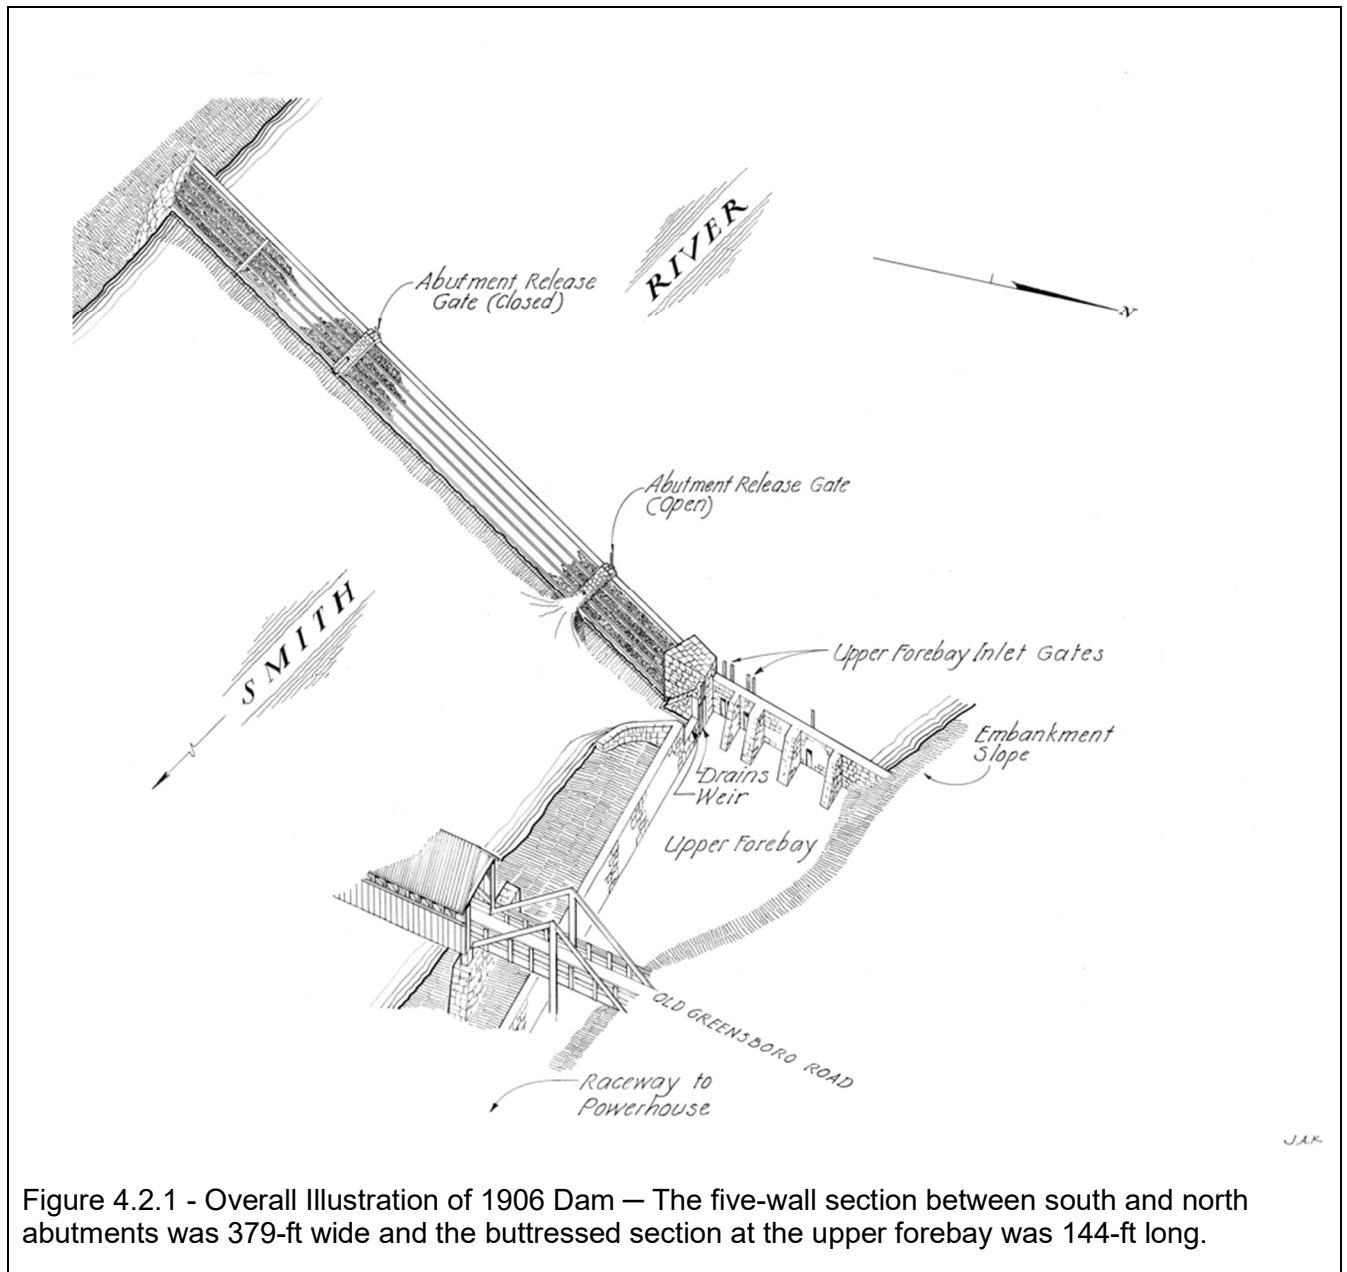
Overall Illustration of 1906 Dam — The five-wall section between south and north abutments was 379-ft wide and the buttressed section at the upper forebay was 144-ft long.
